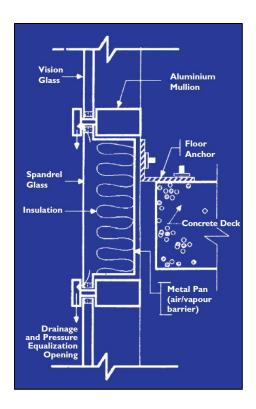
Wall section of a typical stick-built curtain wall system (Quirouette, 1982)
